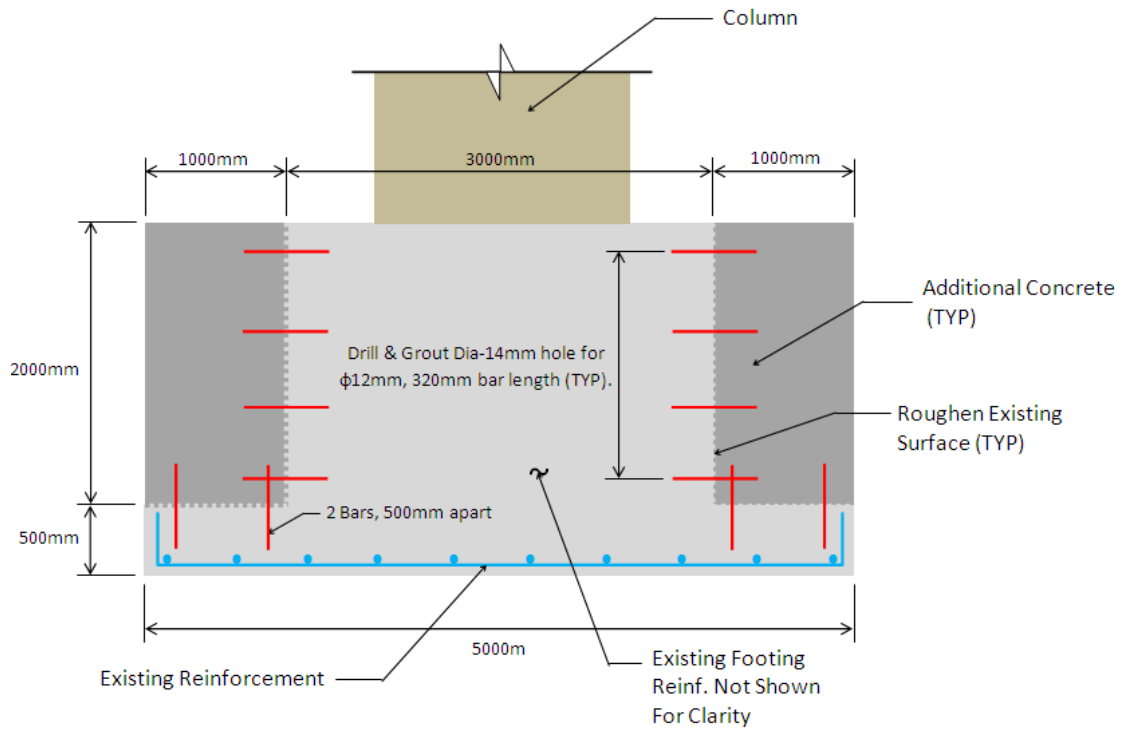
Proposed retrofit scheme for the footings in pier #4 & pier #7.
